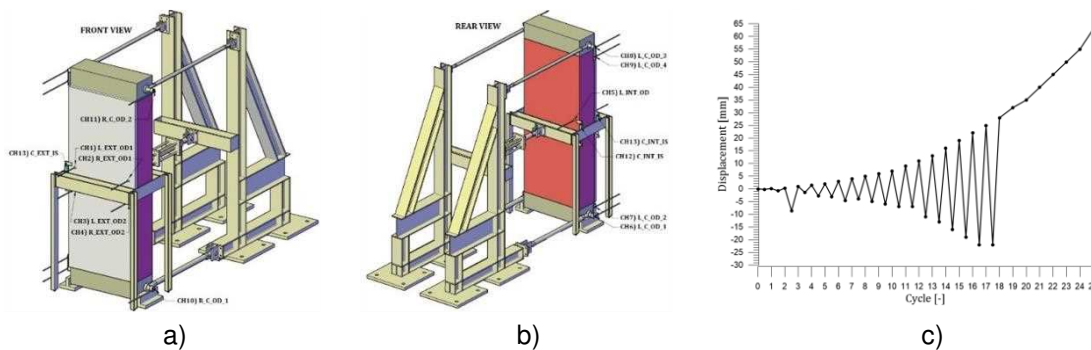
a) Front view of the test setup; b) rear view and c) example of a loading time history.
